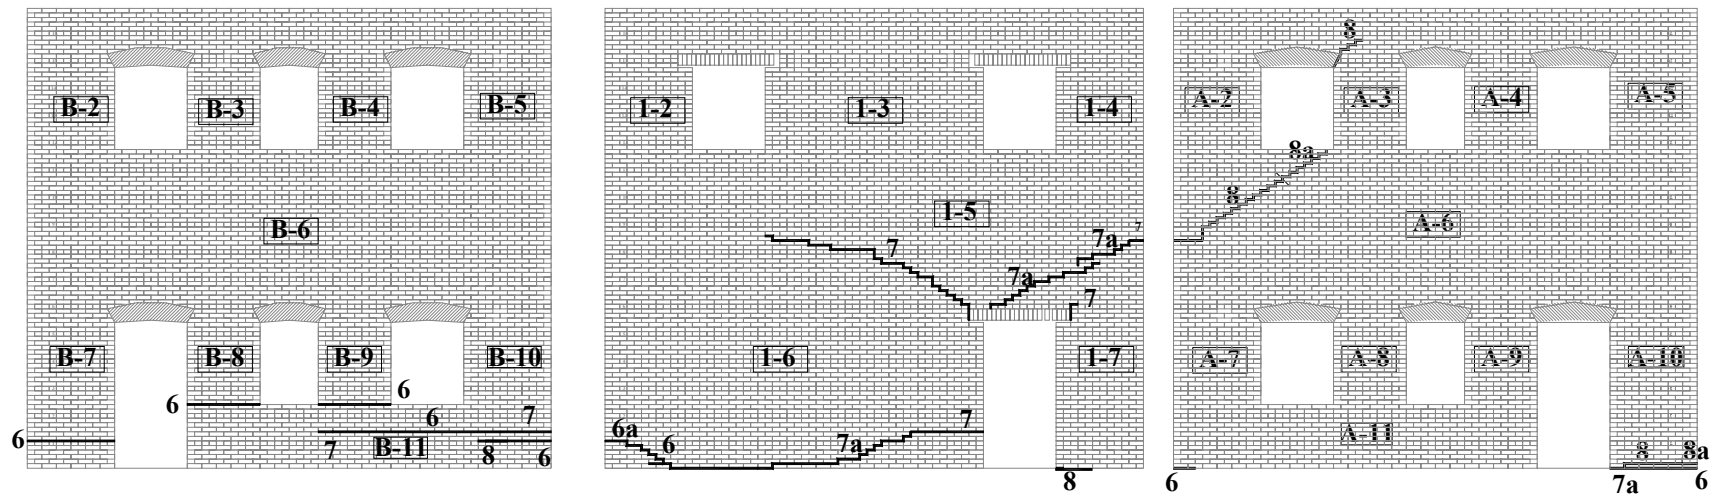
Crack pattern of Wall 1 and adjacent Wall B (left) and Wall A (right) at the end of Cycle 8a. The crack number corresponds to the test run number. Number IDs of each pier are given in the rectangles.
